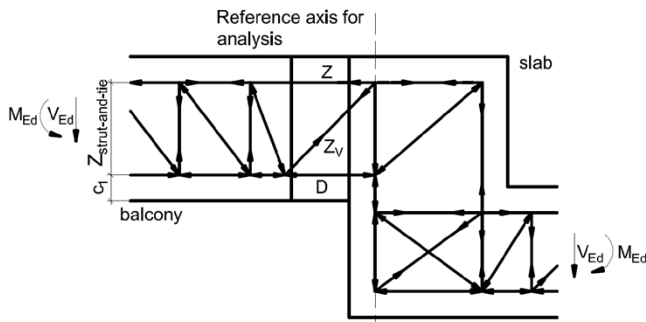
Schöck Isokorb® Type K-O and K-O-F with connection to height offset
